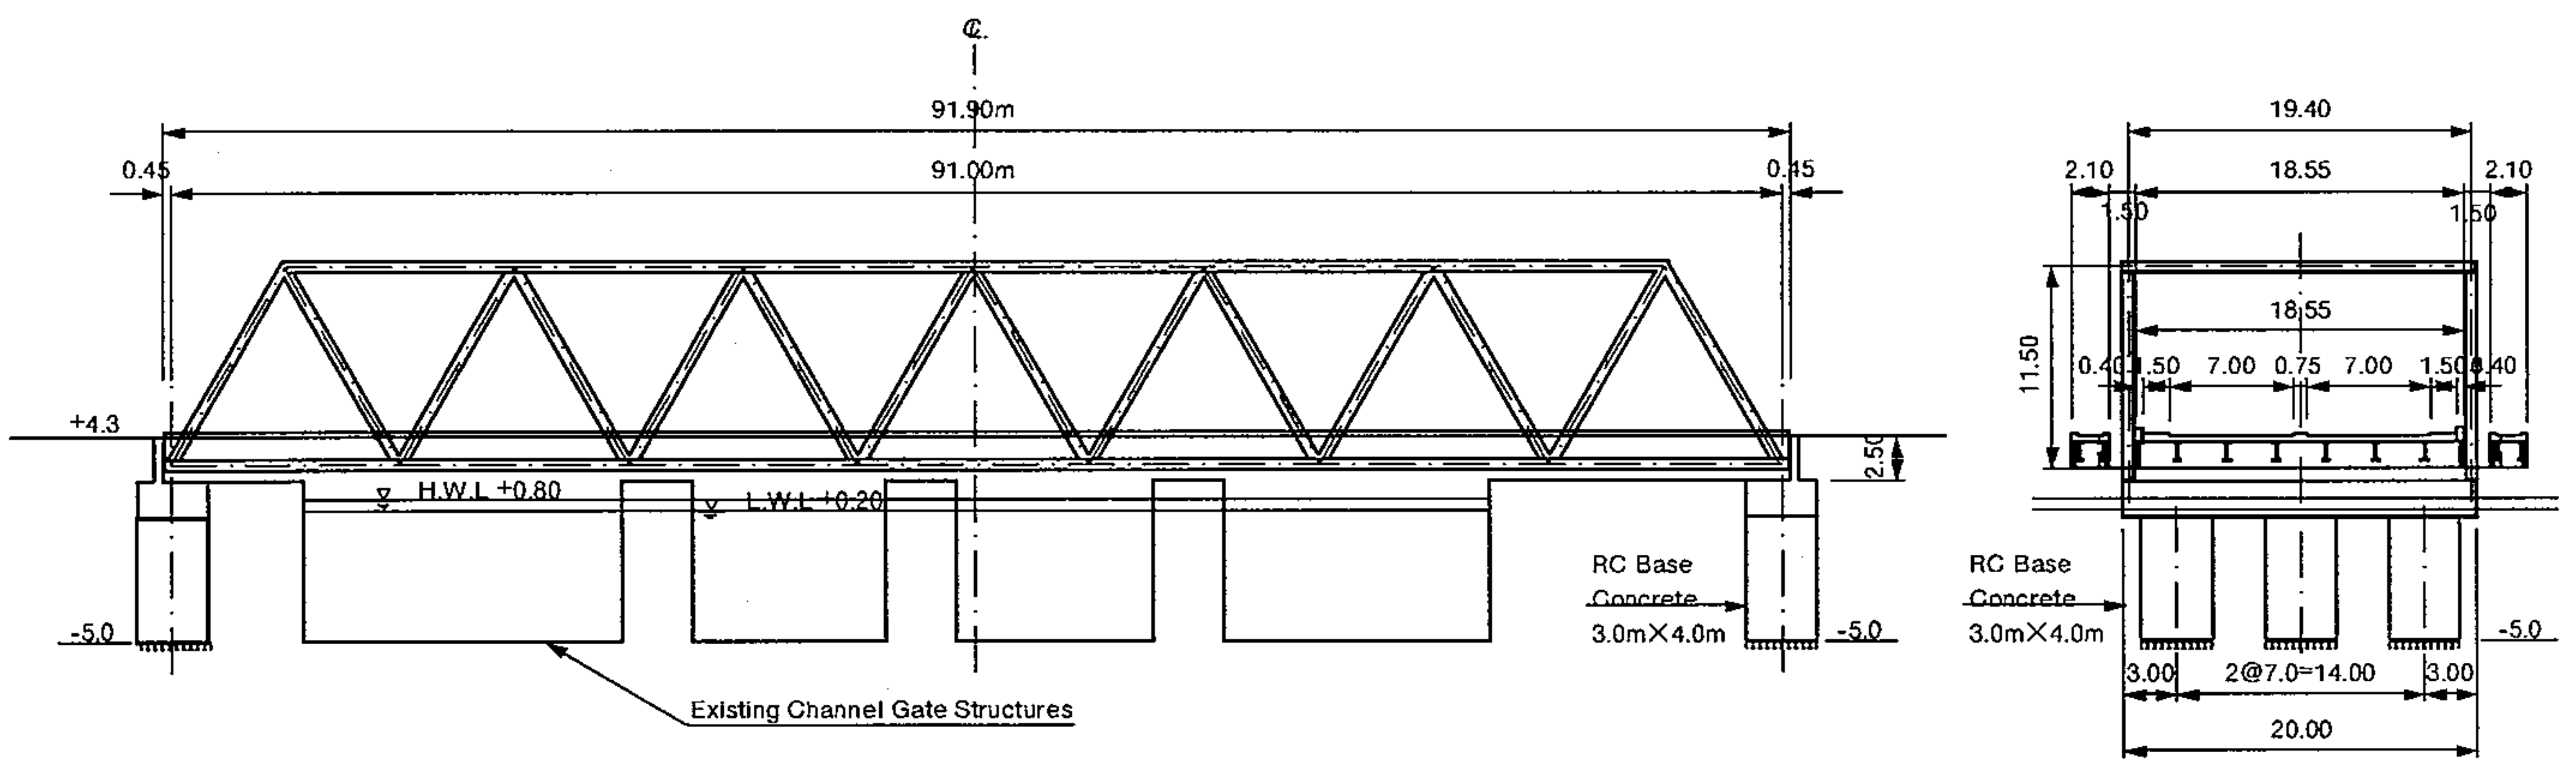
Profile of New Port Bridge at Mahmudia Canal
